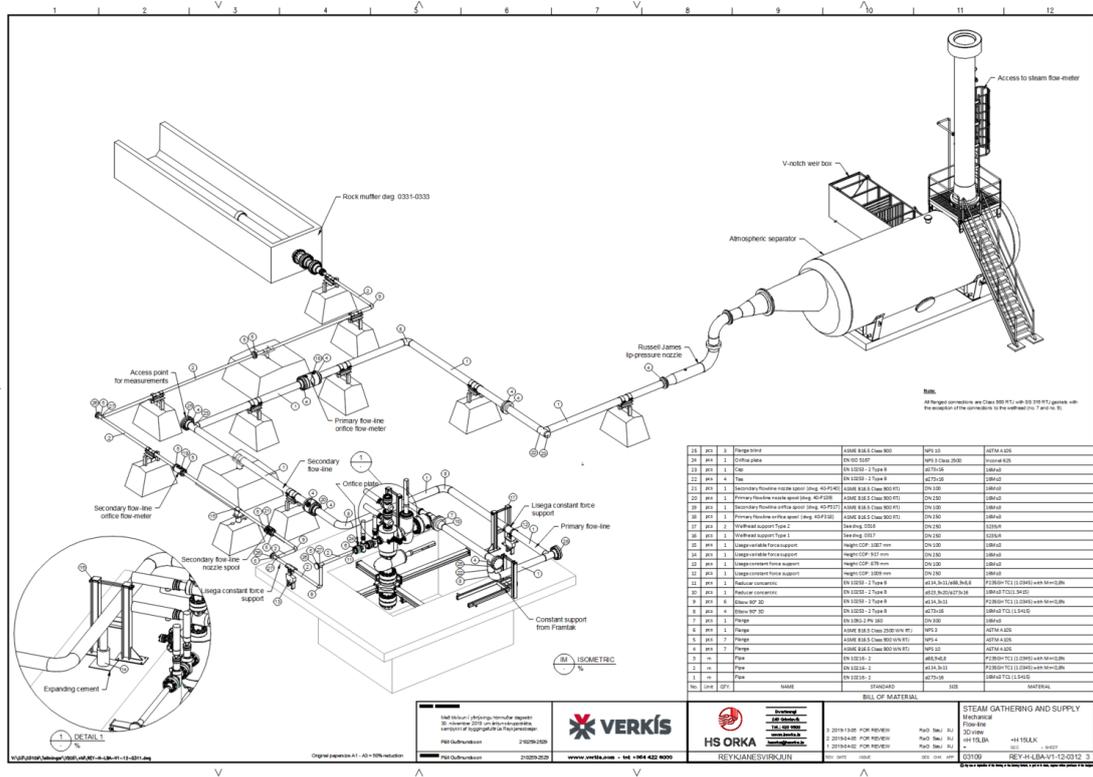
Isometric view of the flow-line and rock muffler plan and section drawing.
